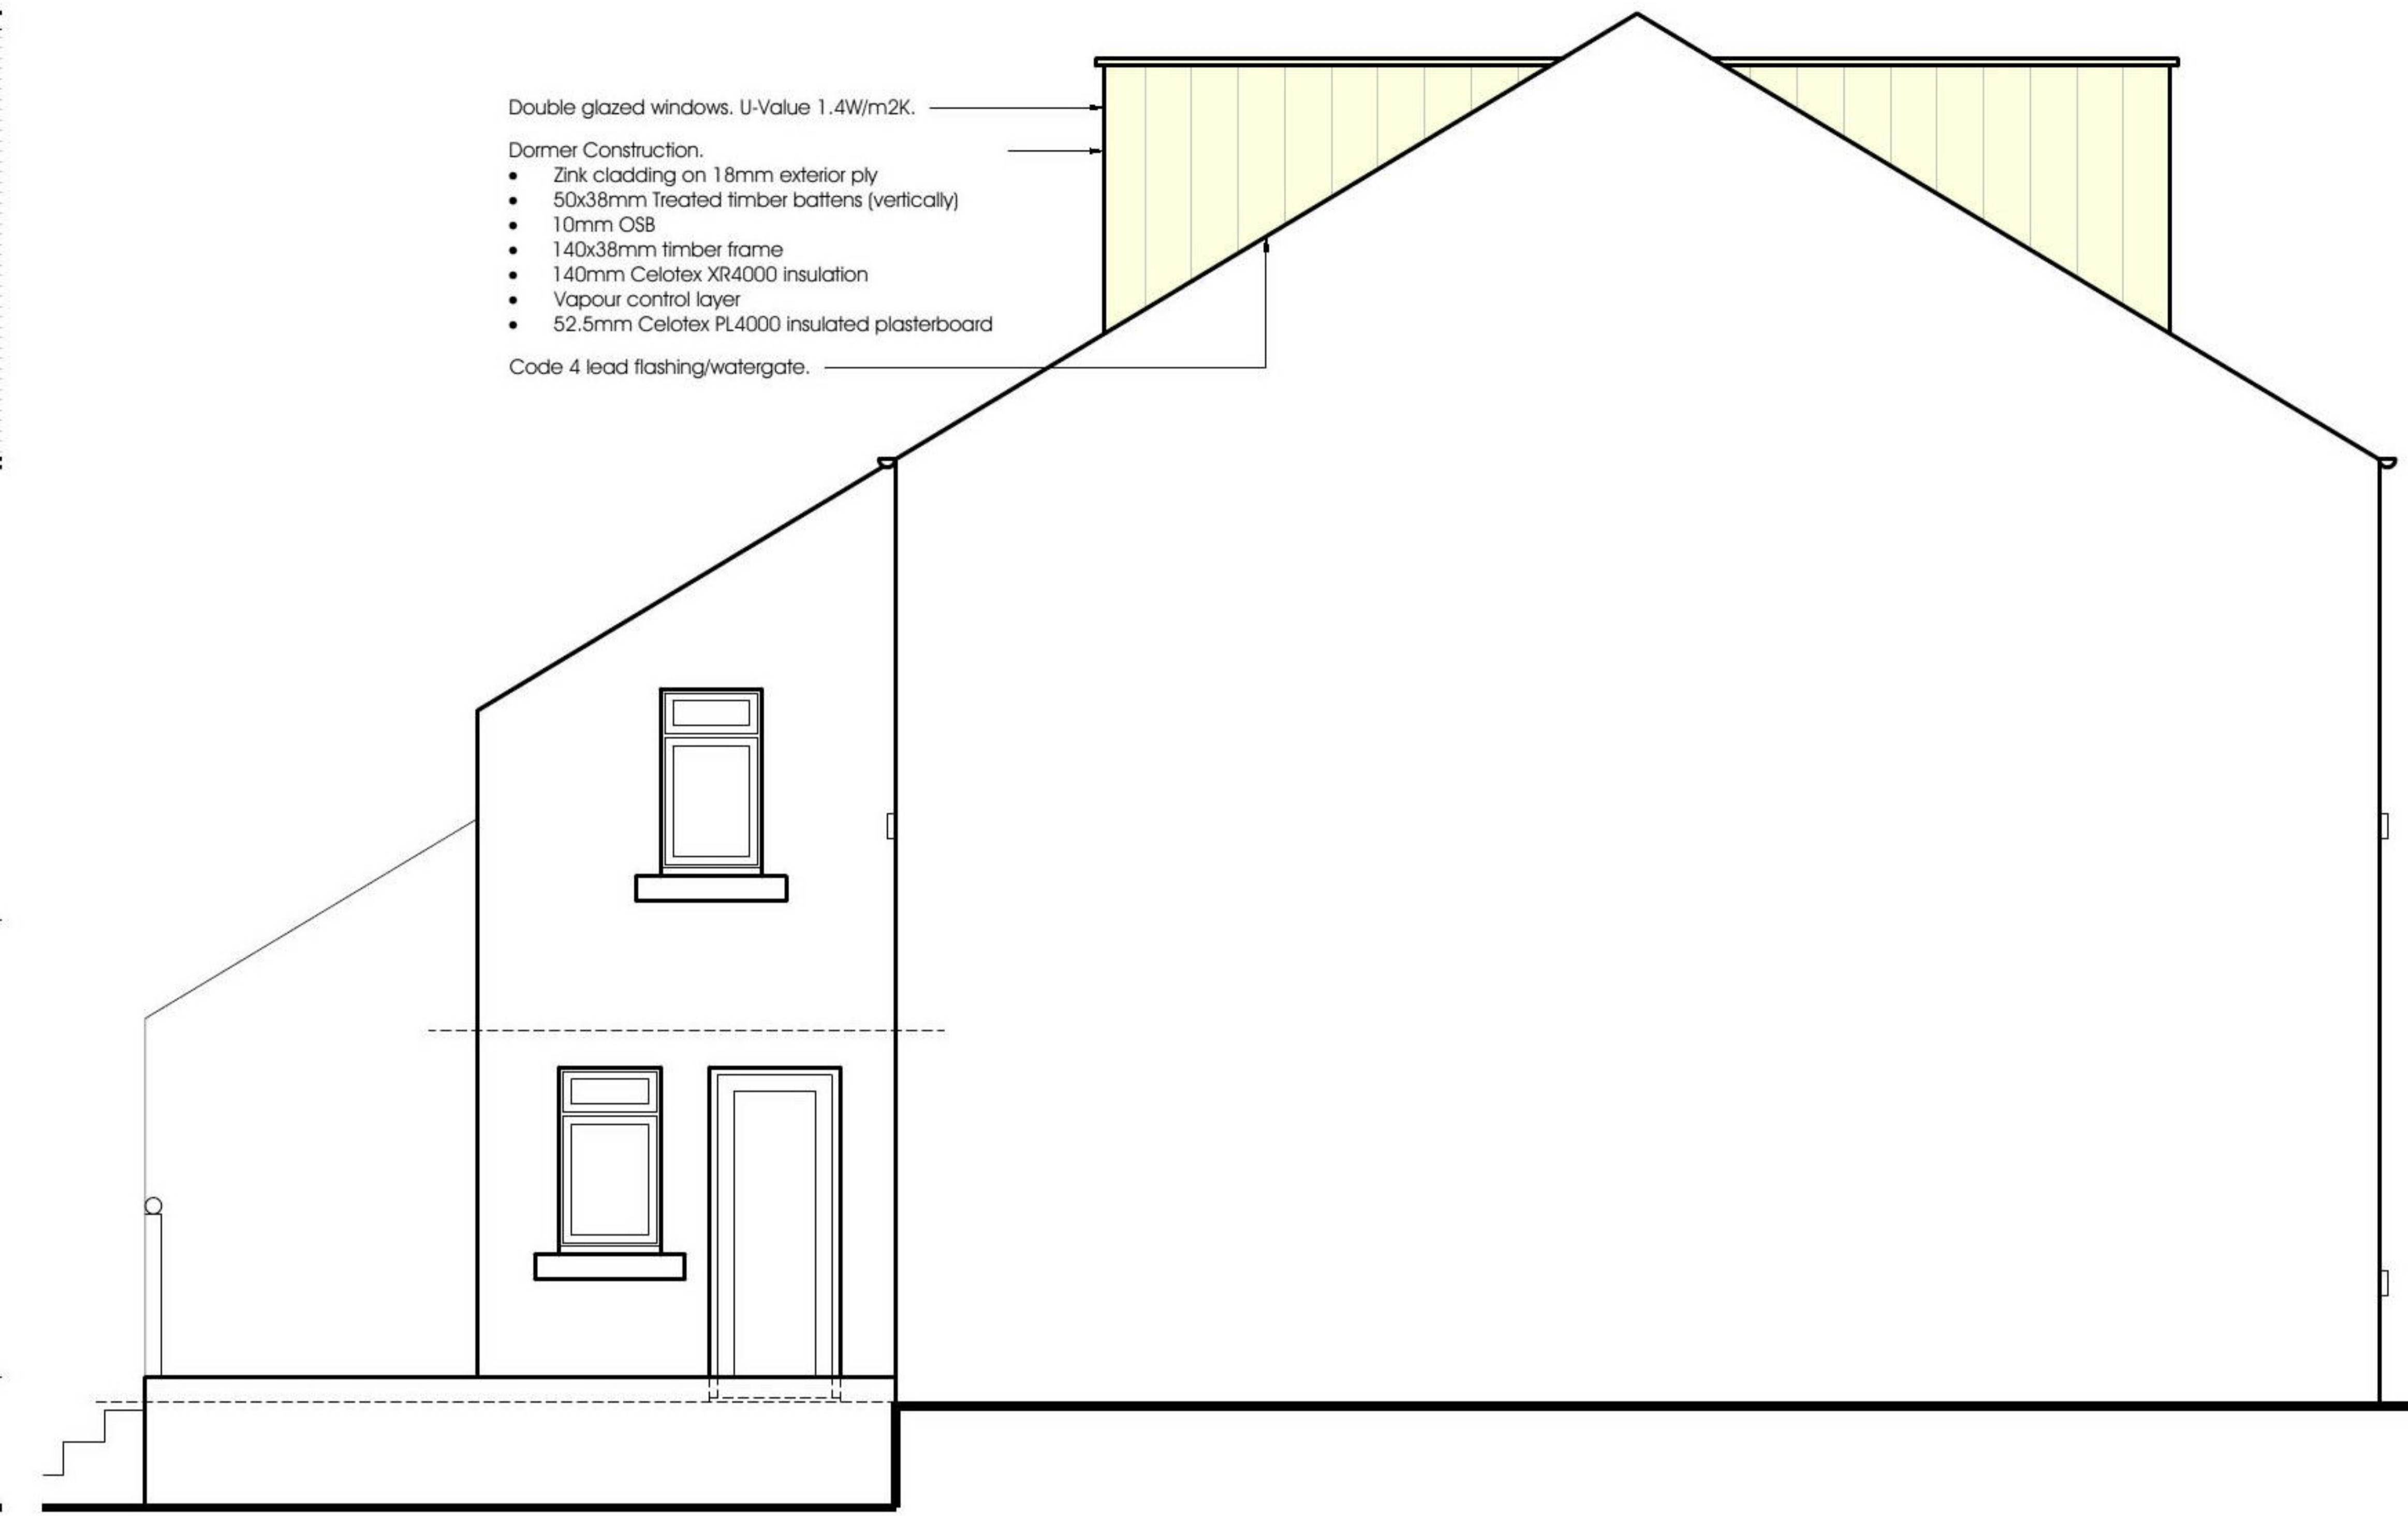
Scale: As Noted Date: Feb 2023 Name: SFAllan Sheet Size: A2
